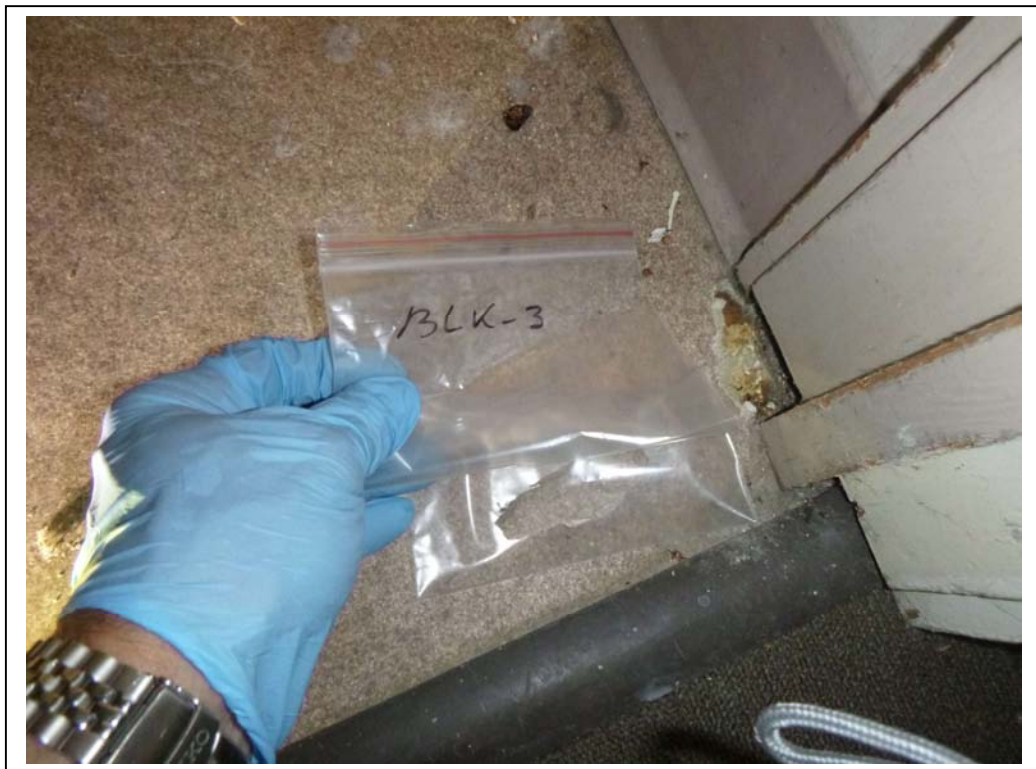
; Sample BLK-3 - Tan Linoleum Flooring View (Sink Closet)
